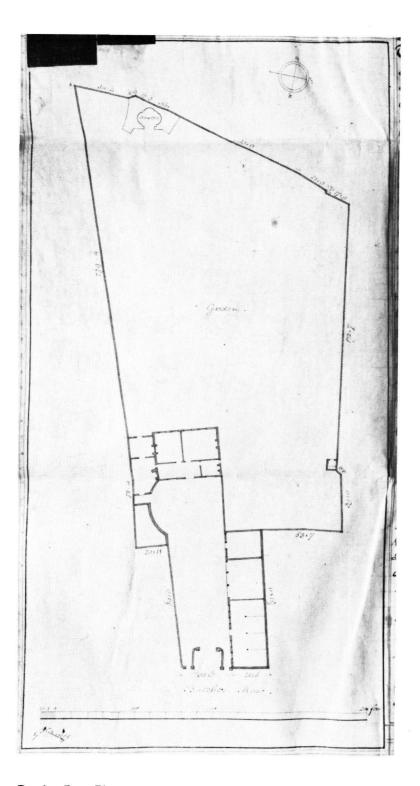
Butcher Row: Plan of the present Master's House, Royal Foundation of St. Katharine
